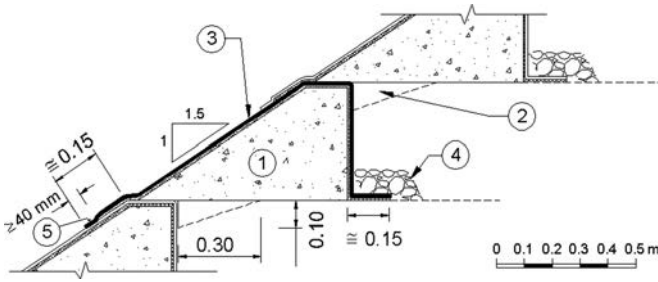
Forming the extruded curbs, details of the PVC geomembrane wings placed over the curbs at Sar Cheshmeh tailings dam (after Vaschetti & Sciuero, 2009). (1) Porous concrete curb; (2) Interlock keys between curbs, 4 m long, centered between two anchor strips; (3) anchor strips  $w = 50$  cm, PVC geocomposite Sibelon CNT 4400; (4) temporary ballast (concrete, gravel, sand, steel bar, etc.); (5) heat weld,  $\geq 40$  mm.
